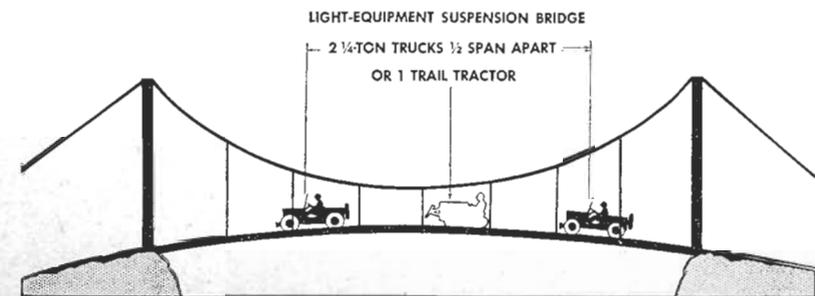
Capacity of light-equipment suspension bridge. The bridge will carry two $\frac{1}{4}$ -ton trucks or one trail tractor.
